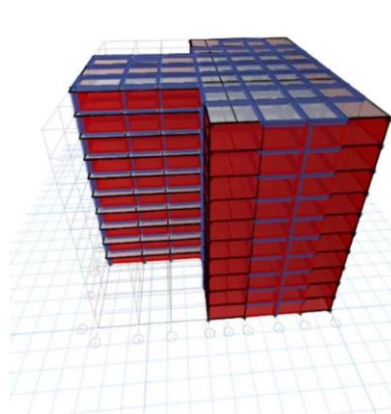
Analysis of Precast Shear wall & Sandwich panel wall
